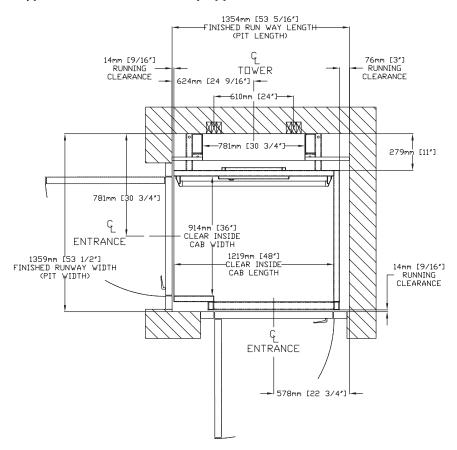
Plan View - Type 4, 36" x 48" Cab, Enclosure Application
